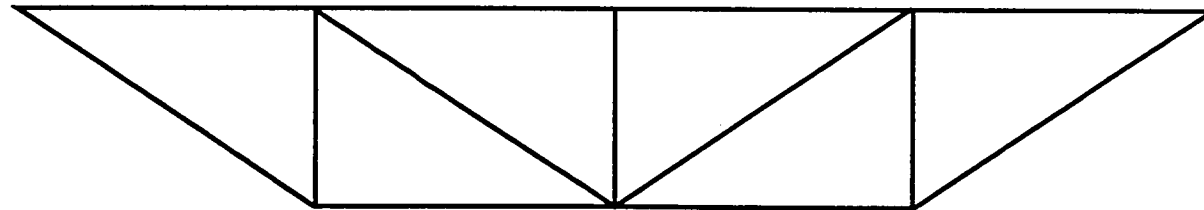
Trussed-Beam System Layout (Ref. 2)
